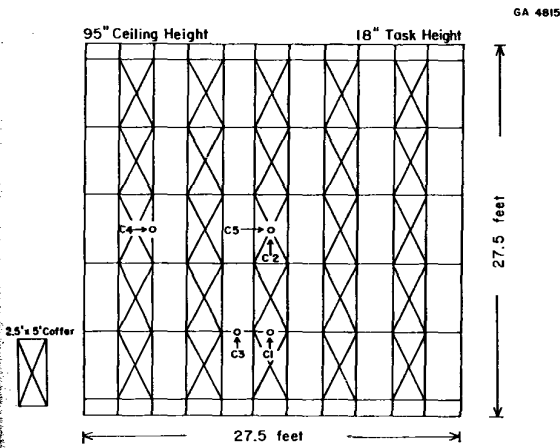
Lighting layout for coffered-ceiling installation showing five test locations.
